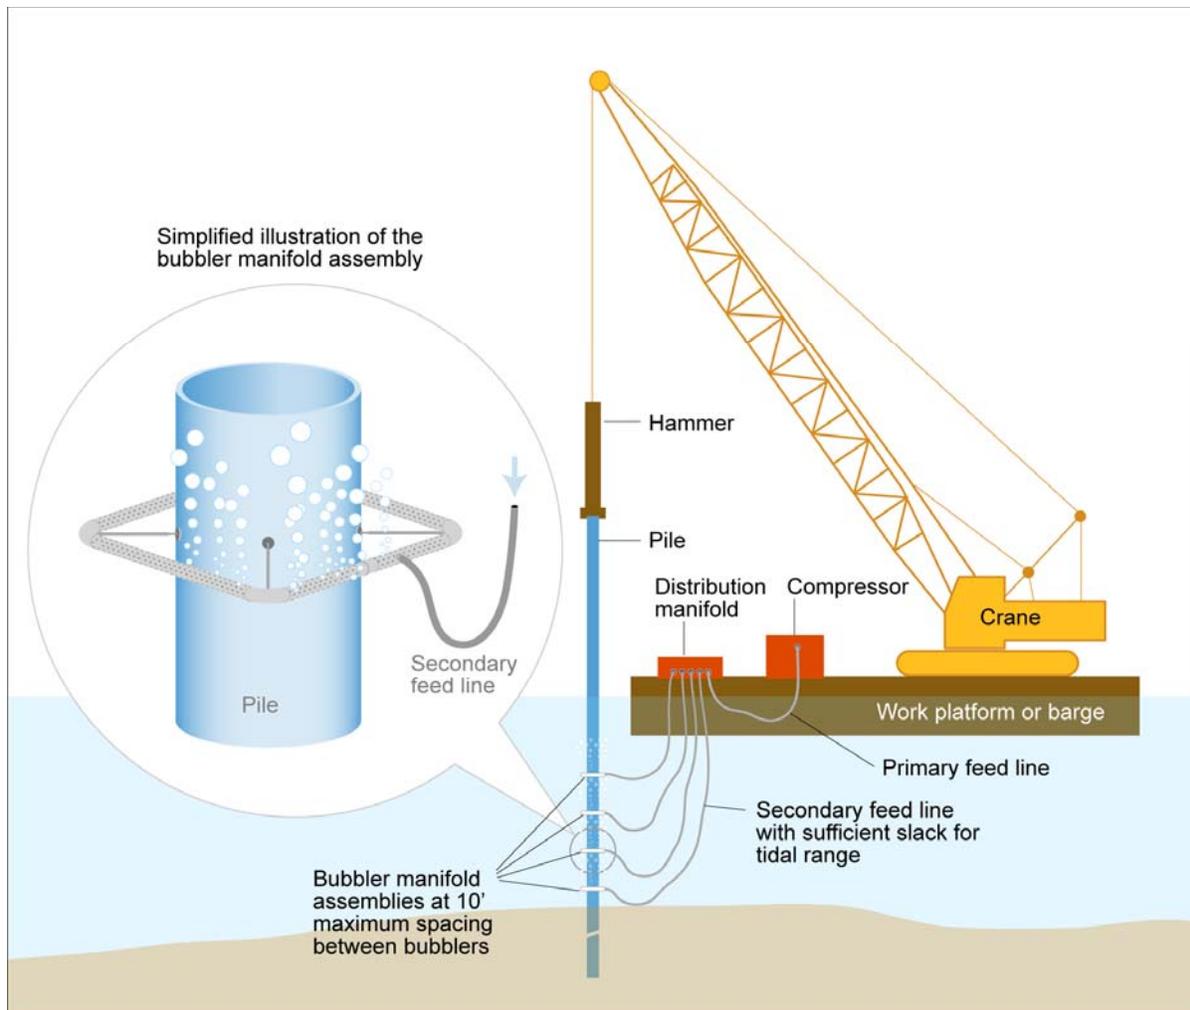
Schematic Diagram of Equipment that Produces Bubble Curtains
